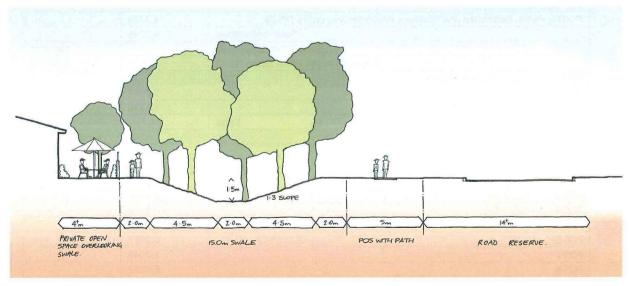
Indicative Drainage Swale Abutting Residential Lots
